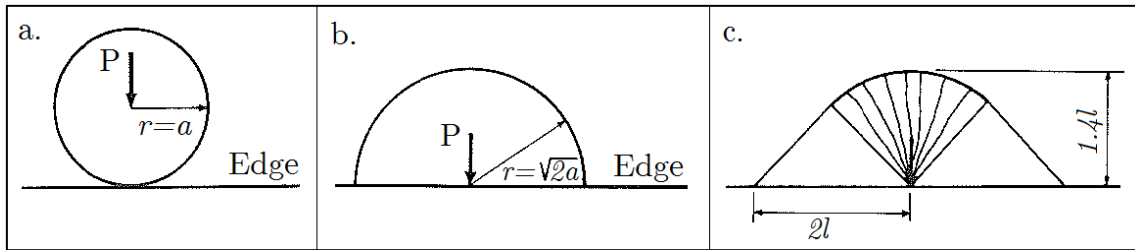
Load and crack patterns for an edge loaded slab (Baumann, Weisgerber 1983): (a) Circular load at edge of slab; (b) Semi-circular load at edge of slab; (c) Yield line formation due to edge loading
